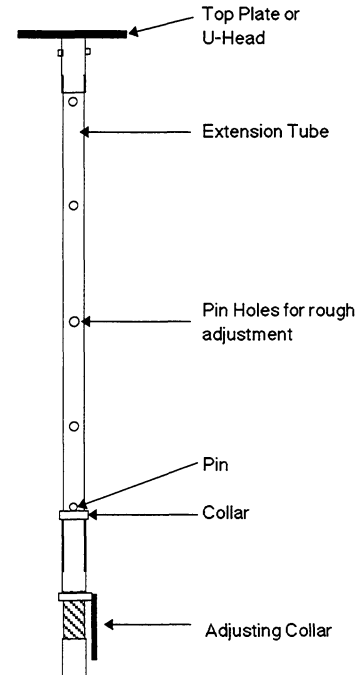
Extension tube (piccolo) with screw Adjustment
